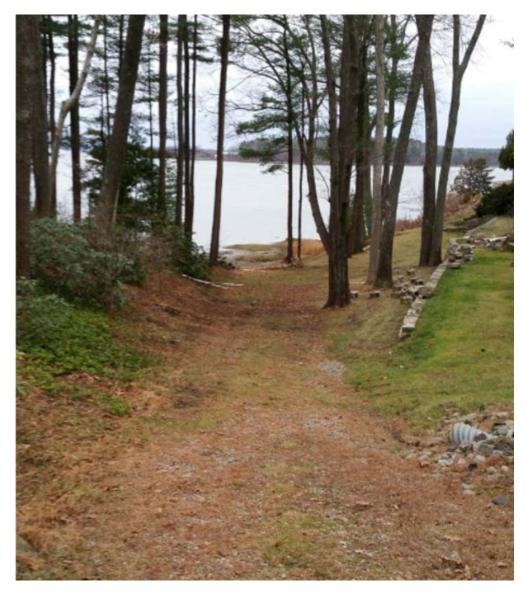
Pre-construction photo of Gundalow Landing looking northeast on 03/21/17
